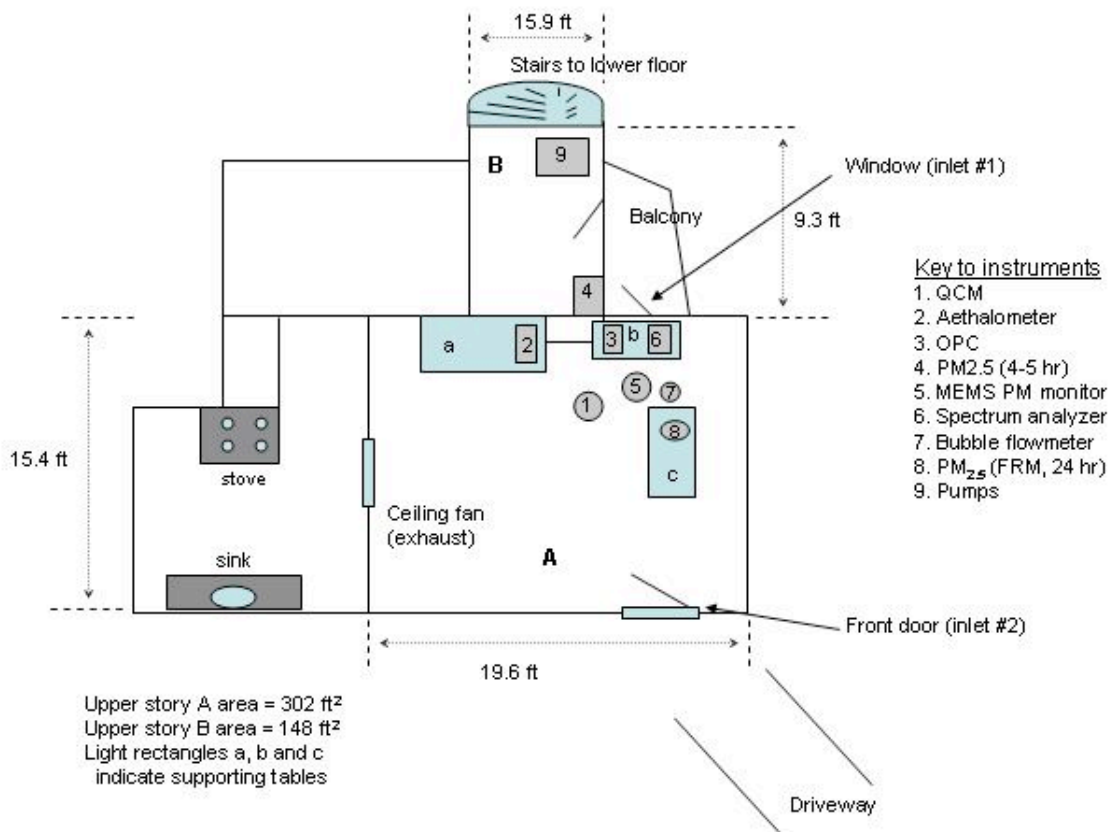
Floor plan of house in which field testing was conducted, showing locations of instruments, the MEMS PM monitor, and the window and door air inlets.
